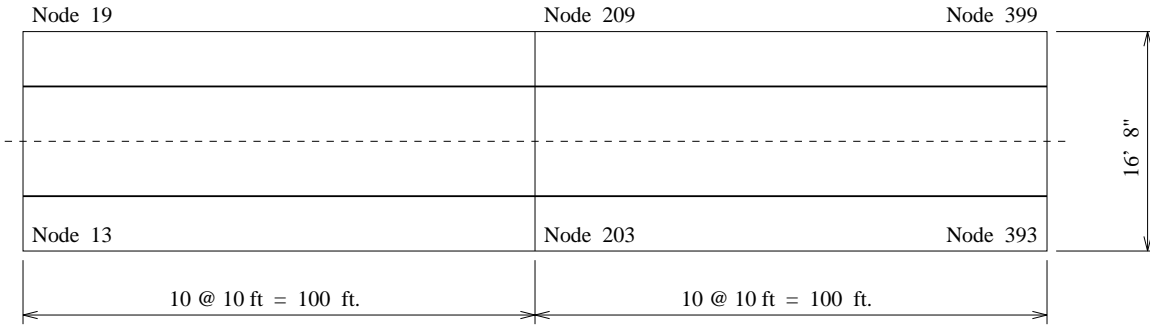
Highway Bridge : Plan of Finite Element Mesh for Two-Span Continuous Highway Bridge
